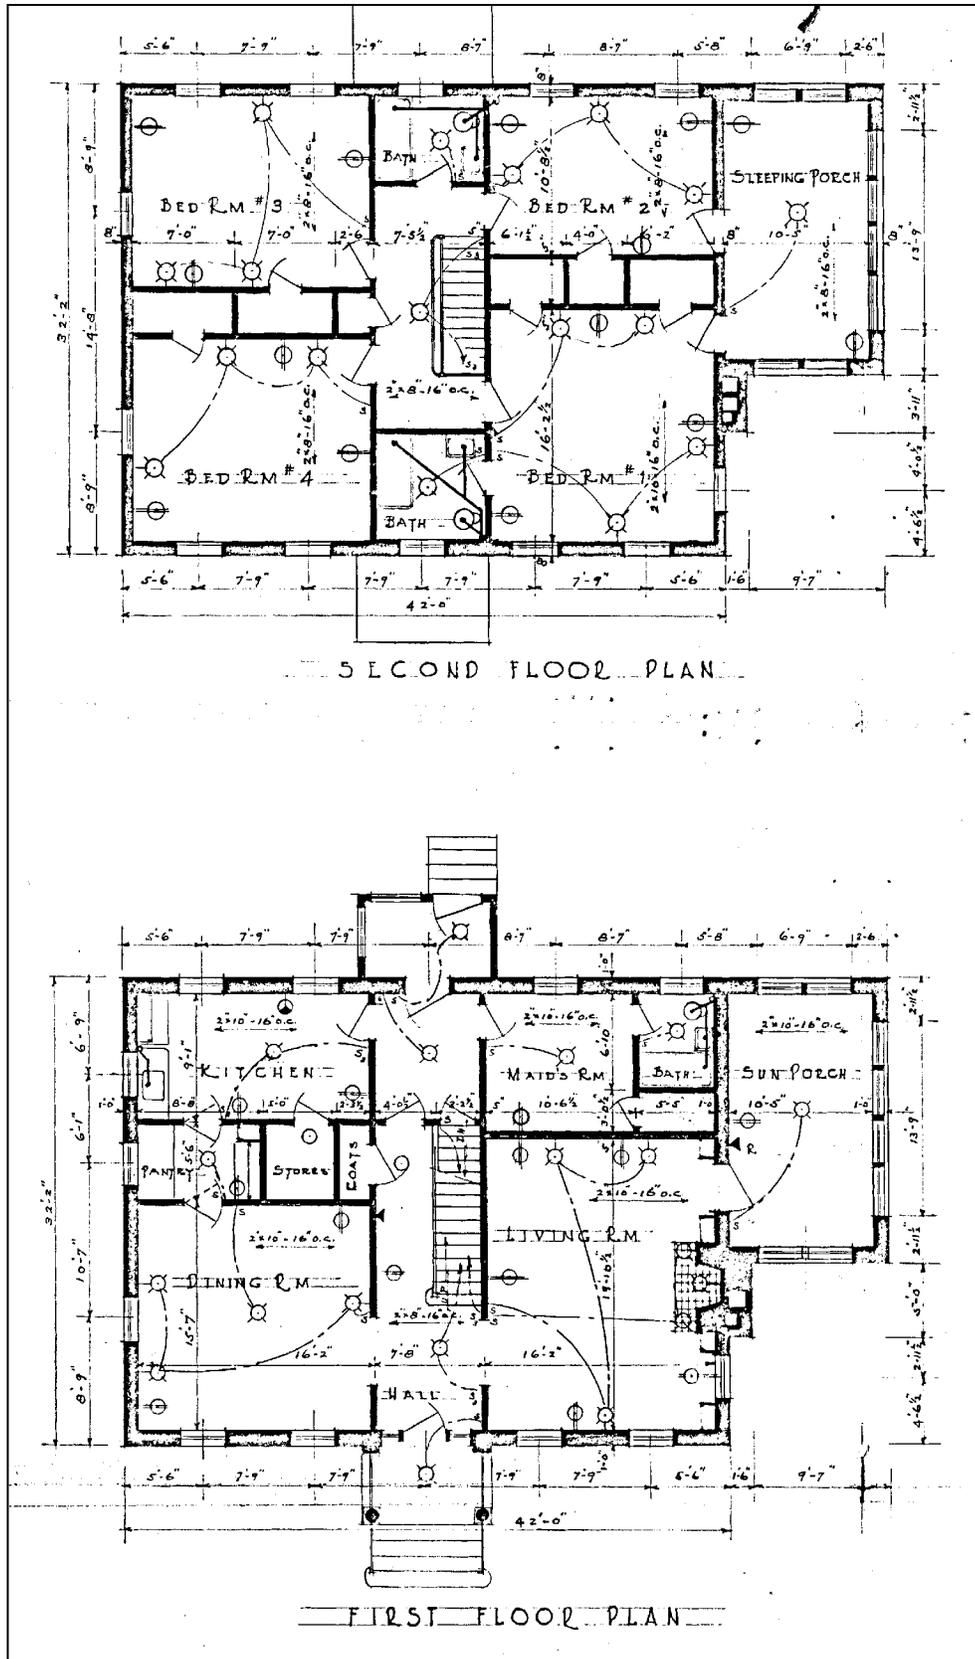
Floor plan for two-story field officer quarters at Fort Lewis, Washington (Source: U.S. Department of the Army 2021).
